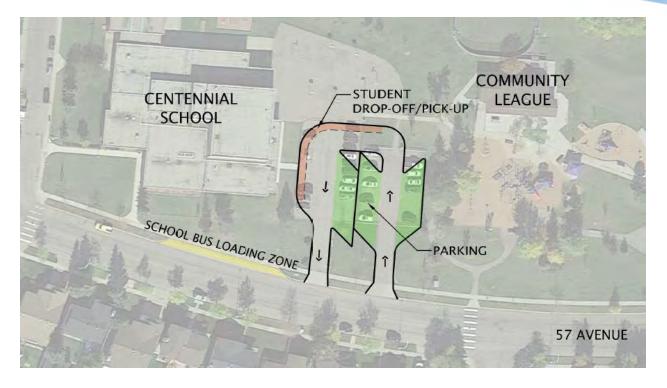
Existing school retro-fit to add on-site drop-off/pick-up
